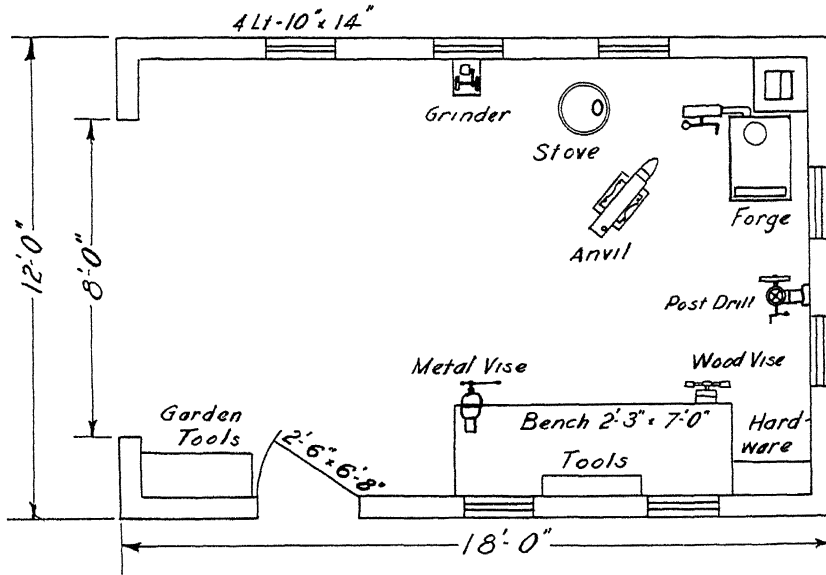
The above drawing represents a suitable sized room and placement of the tools and equipment, also the location of doors and windows. The floor plan shows a good farm shop layout. The plan in general could be adapted to almost any room that might be available on the farm.
